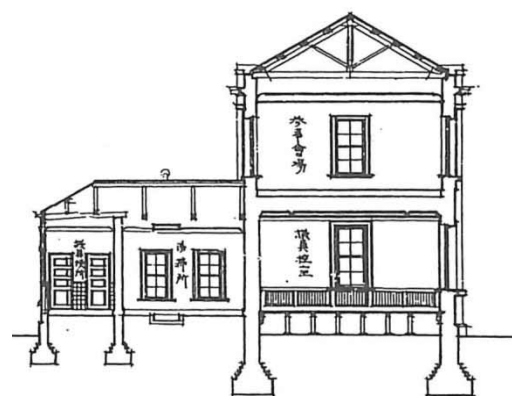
Cross section of east approach in 1916, when the Assembly Building was constructed
